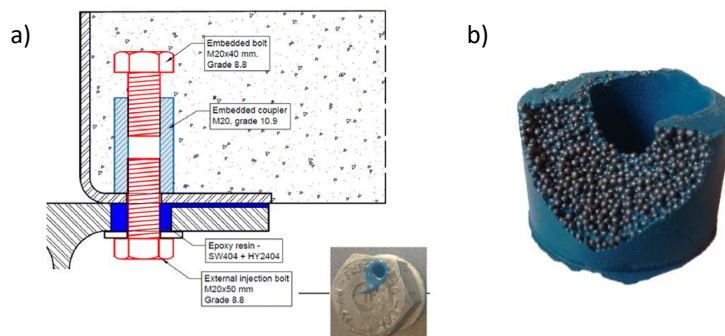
a) Demountable shear connector for composite floor systems [2], b) Cross-section of SRR [3].
